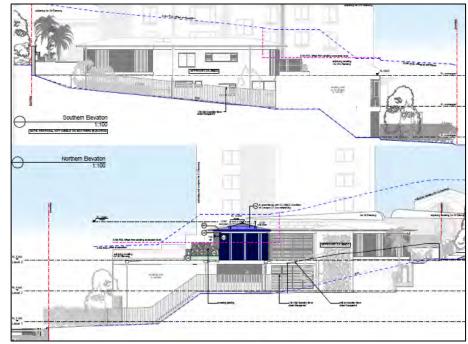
Side elevation plans depicting the proposed built form and ground level at the side boundaries of the site.
